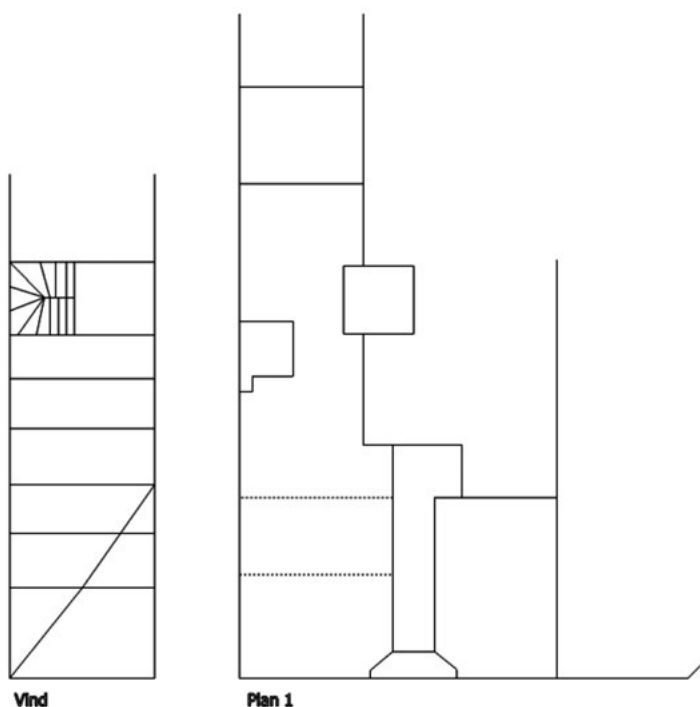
Smedjegatan 22, layout (Plan 1 means ground floor, vind means attic). By Ulrik Hjort Lassen.
